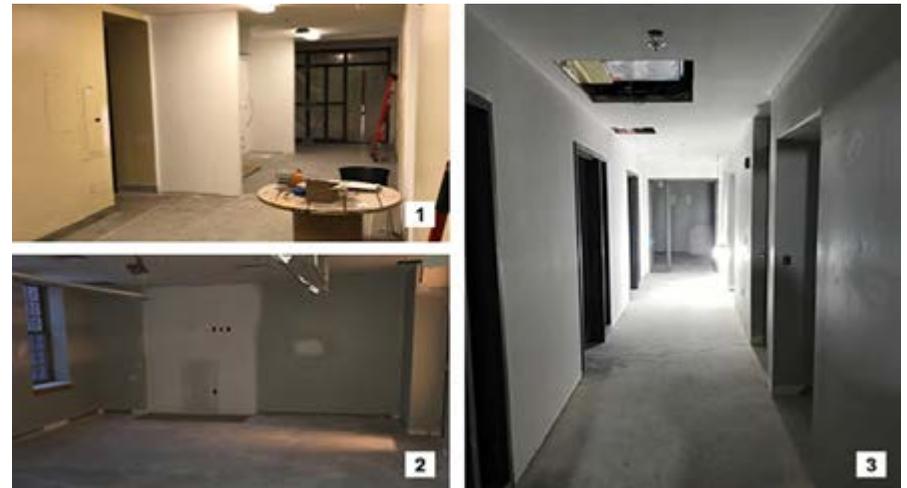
Interior view looking at the new reception area. (2) Drywall installed with paint ongoing in the War Room. (3) Finished drywall and painting ongoing in the preconstruction offices
